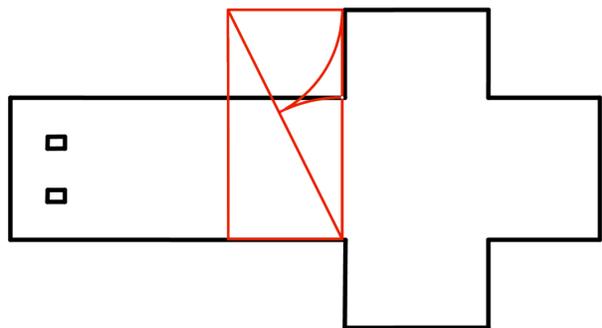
Geometric construction to verify golden ratio in Sta. Barbara Church floorplan.
